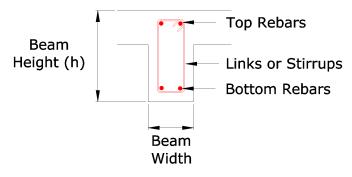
REINFORCED CONCRETE SUSPENDED BEAM
